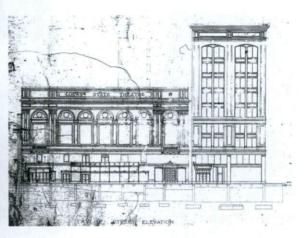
Warfield Theater Building. Original Taylor Street elevation (1 September 1920). Source: Building Permit Application #094075, plans: roll #8653, frame #353-9.
